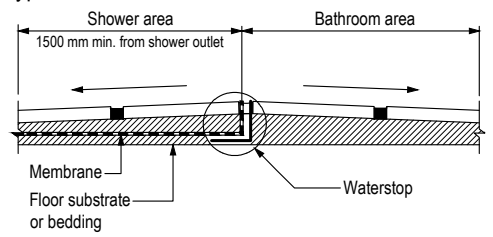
Typical preformed shower base/floor junction on timber floors, including particleboard, plywood and other timber materials
